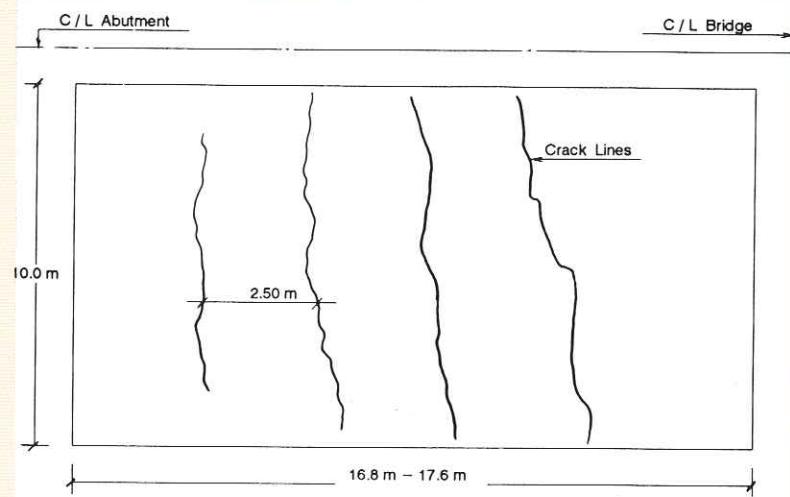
APPROACH SLAB AT STRUCTURE 13 - 2 ( SOUTH )
